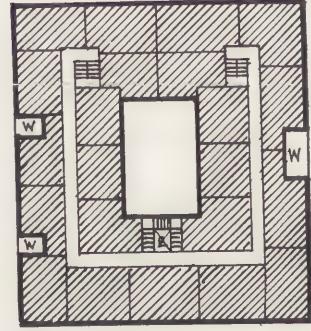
FIRST AND TYPICAL FLOOR PLANS—APARTMENT BUILDING AT 305 WEST 45TH STREET, NEW YORK CITY.
